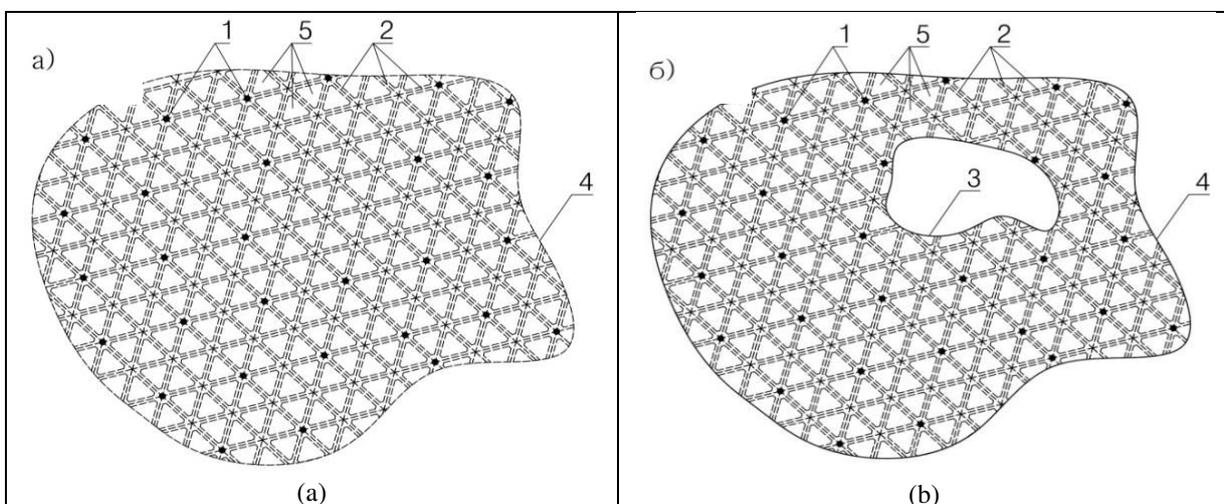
The design of the base plate and floor slab: (a) base plate; (b) floor slab; 1 - pillar; 2 - internal stiffener; 3, 4 - internal and external edging by stiffener; 5 - liner.
